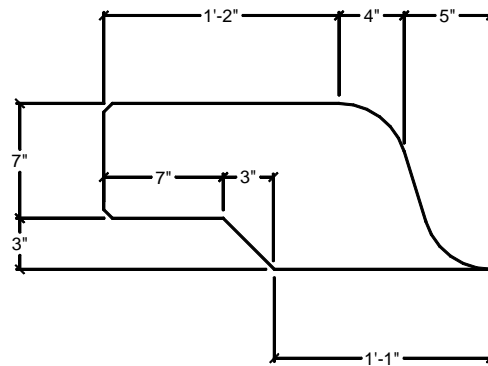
Slaughter Creek Bridge Cross Section
